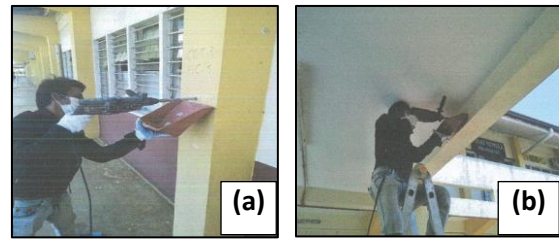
Concrete dust sampling by drilling concrete column (a) and beam (b) to a certain depth for Chloride Content Test.
